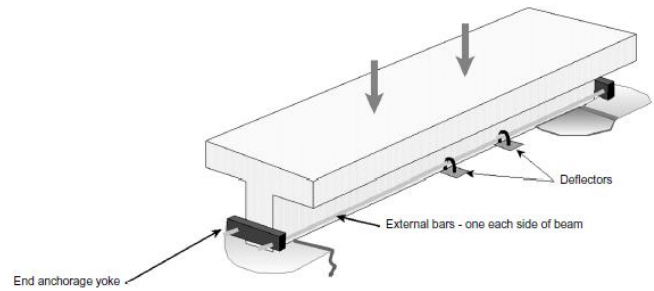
Typical strengthening technique of RC beams with external reinforcement (Khalil *et al.* 2008)
